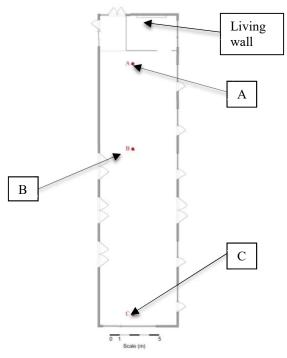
Location 2 floor plan - Narthex - St. Gabriel's Passionist Church, Toronto, Ontario, Canada, The Passionist Community of Canada, Owner. Larkin Architect Limited, Architect.
